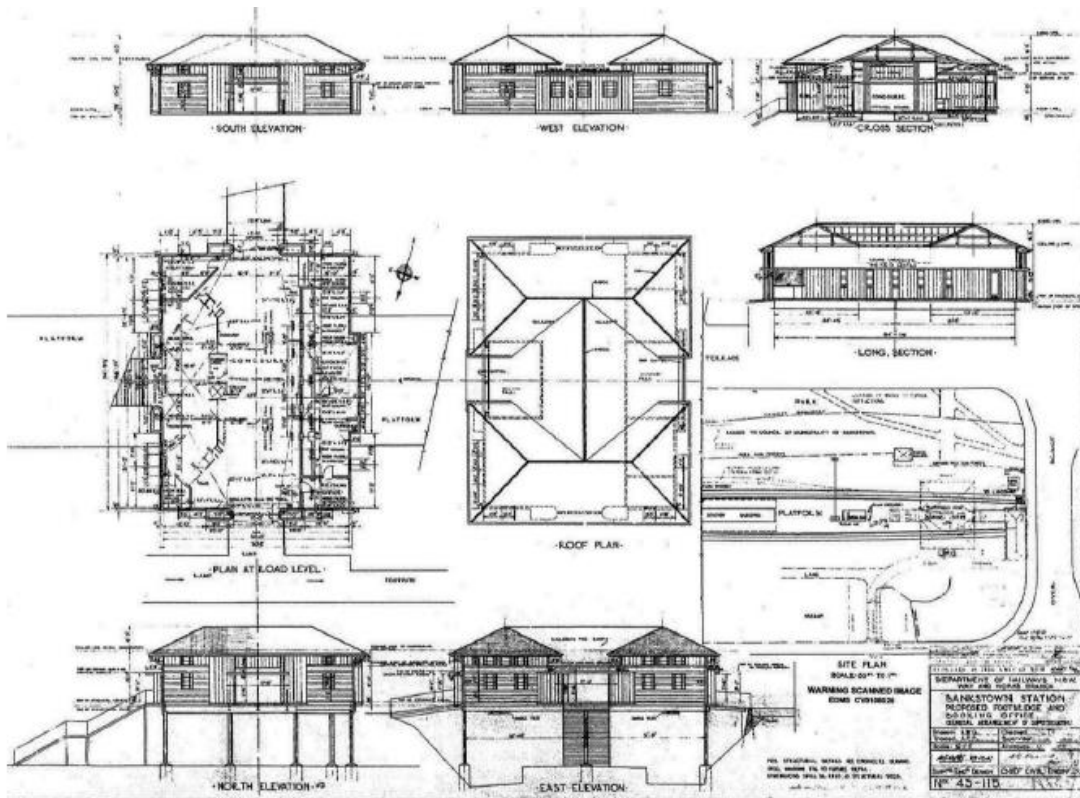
Plans for the proposed footbridge and booking office, 1947. Source: Sydney Trains Plan Room
